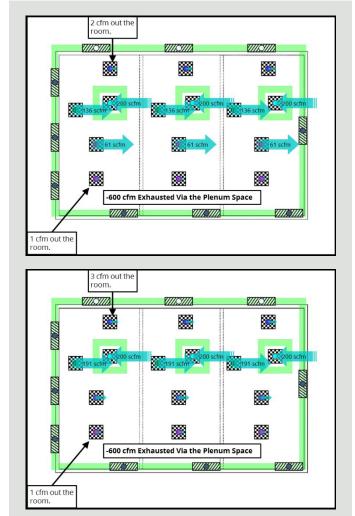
Adjacent Rooms with Ducted Supply and Ductless Return – Category 1 – Standard Ceiling Panel (top) and Category 3C – AirAssure Ceiling Panel with Clips (bottom) - See Figure 4 for the Ceiling Plane Arrangement
